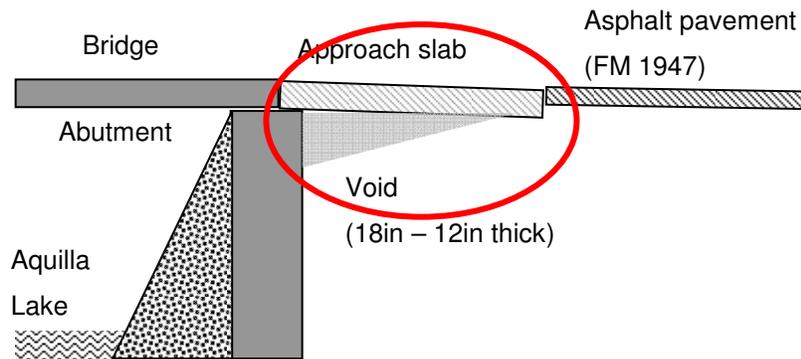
Problem definition sketch of FM 1947 Bridge site, Hillsboro, Texas
